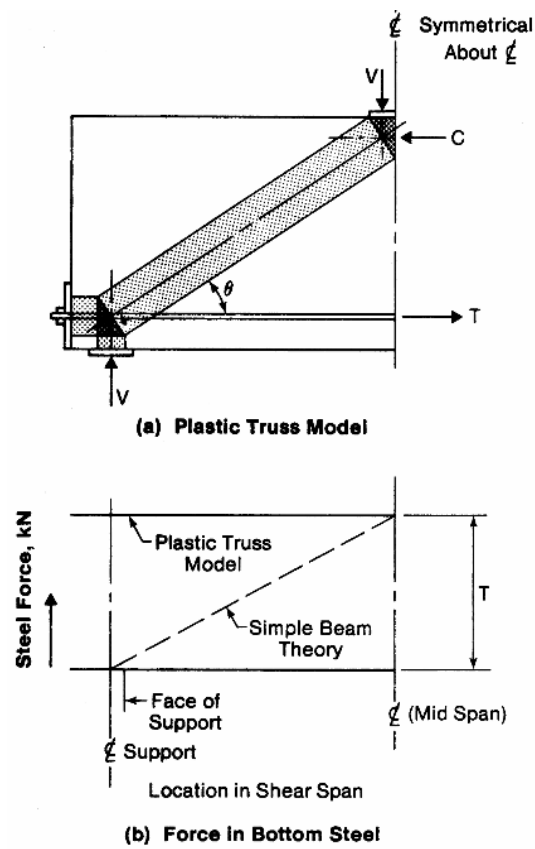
Plastic truss model for beam without web reinforcement (Rogowsky and MacGregor 1983)
